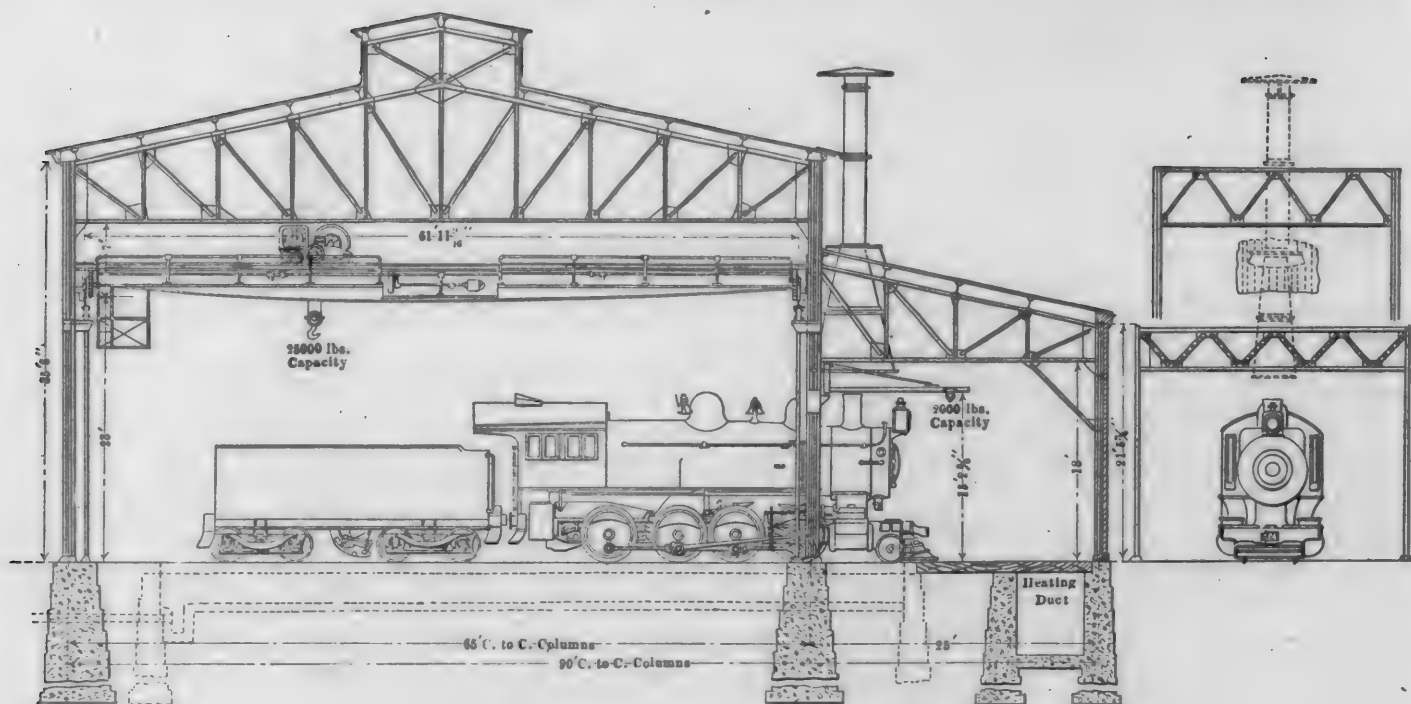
CROSS-SECTION THROUGH THE ROUNDHOUSE.
